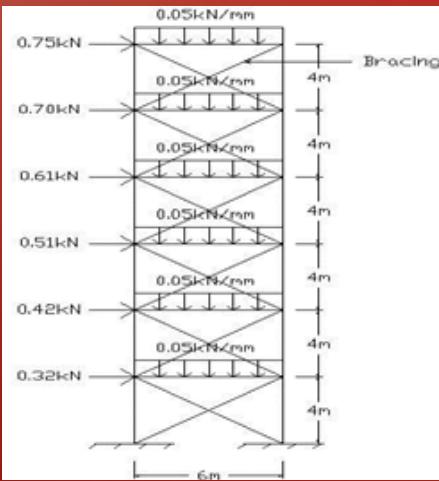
Analytical model for Case 3 : Steel frame structure with fully braced
